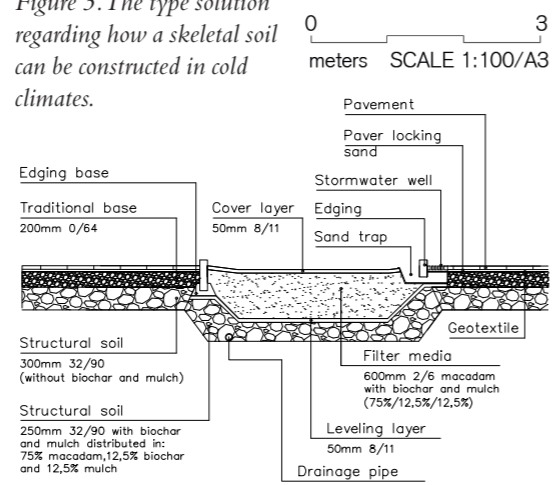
The type solution regarding how a rain garden and a paved surface can be constructed in cold climates.
